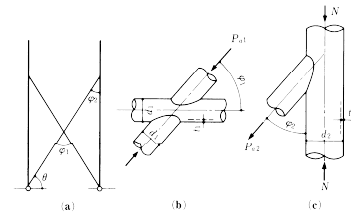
Joint Detail of Steel Pipe Bracings
